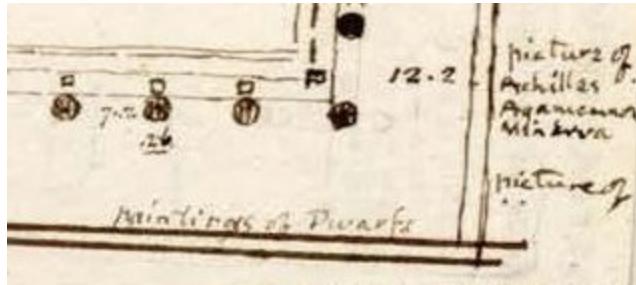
Detail of fig. 1, showing the southeast corner on Gell's plan.
